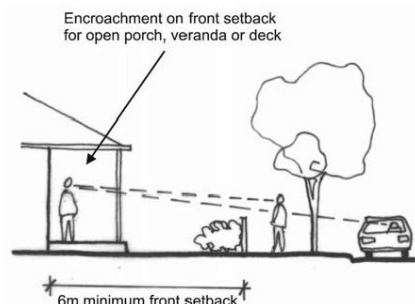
Dwelling design with front porch that allows surveillance to and from the street
